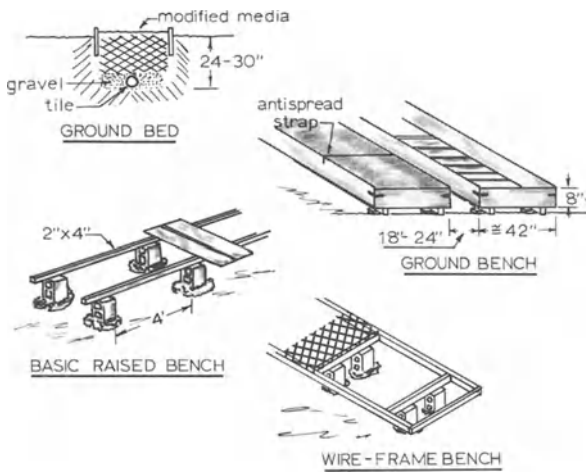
Basic construction designs for greenhouse benches. Note concrete blocks are placed on small piles of concrete to facilitate leveling and promote rigidity
